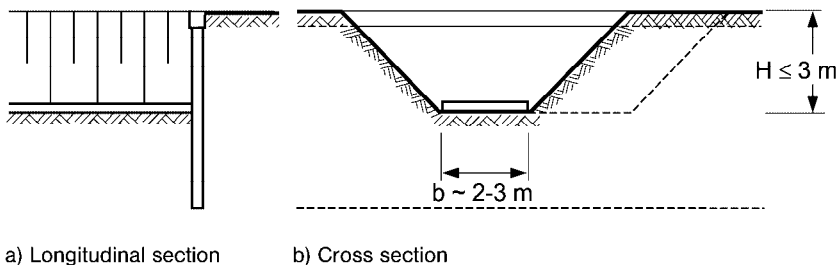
Unsupported retaining wall in soft soil after installing the first strip of blinding concrete
